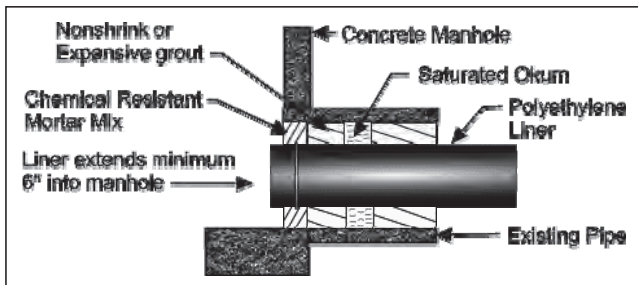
Typical Manhole Seal for Gravity Flow Applications
